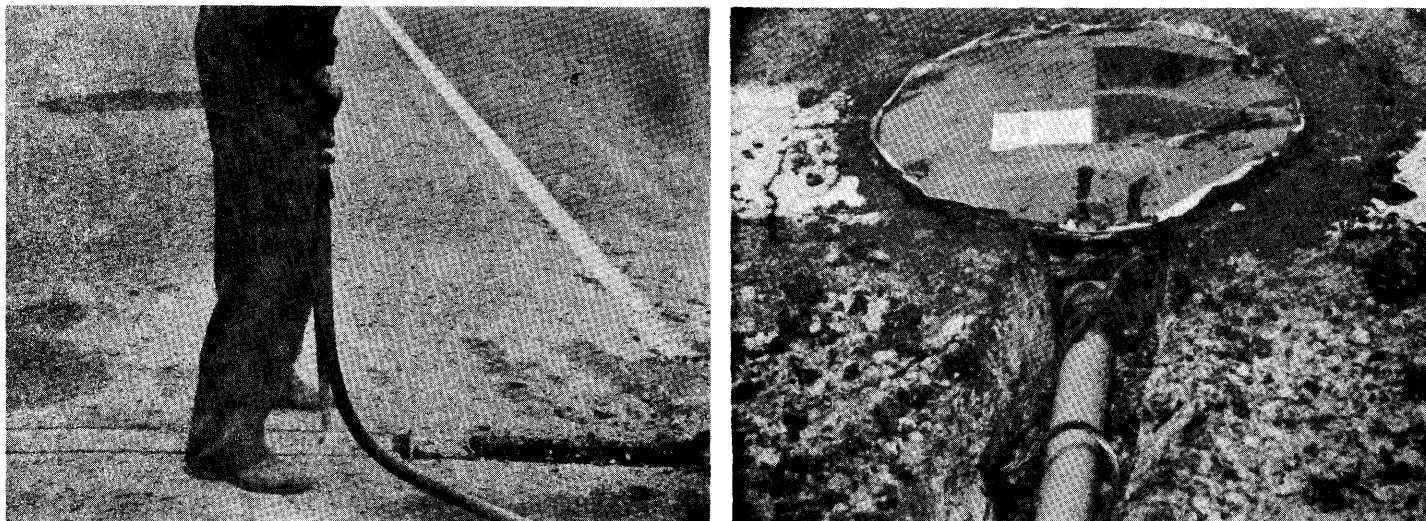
Cutting trench for conduit at left, conduit in trench at right.
